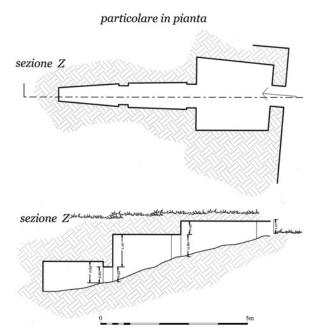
The lesser burial space of the Garden Tomb complex. Floor plan detail and cross-section of the double loculus system.
